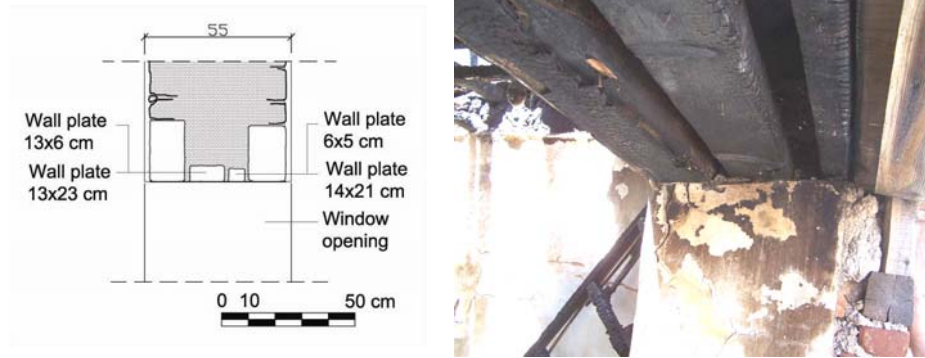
Wall plates used as a lintel above the opening in rubble stone wall. (Şeyh Cami St. No: 32)
